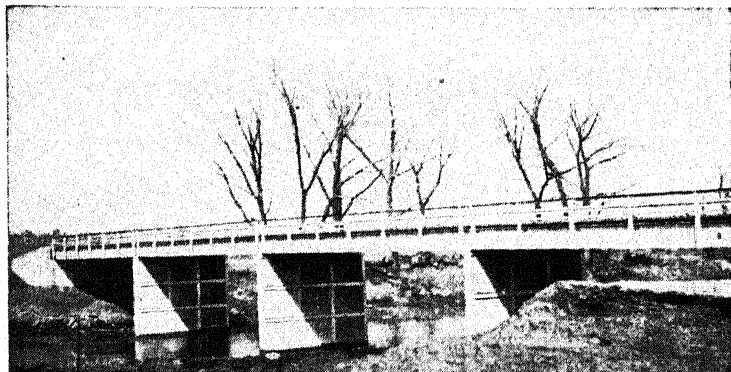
Completely arc welded highway bridge, four 50-foot spans, 20-foot roadway.
